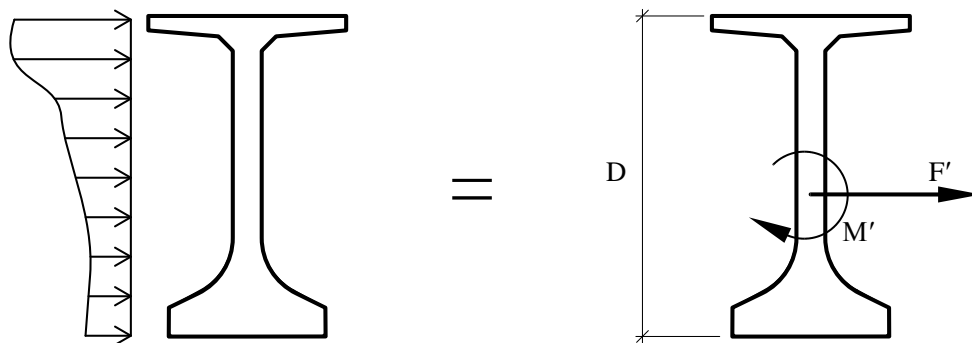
Two-dimensional bridge girder cross-section with in-plane line loads
